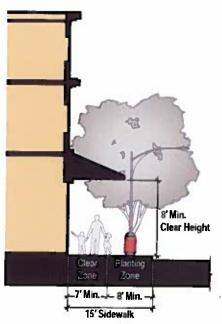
ERC Core Transit Corridor (CTC) Sidewalk Standards
